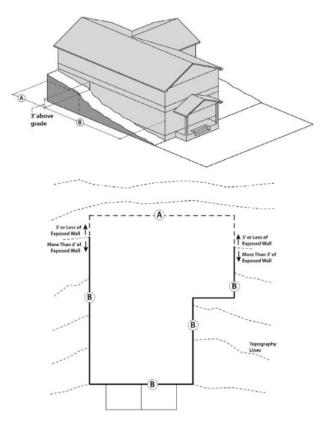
Floor Area Ratio Calculation for Lowest Level Floor with Totally or Partially Exposed Walls
